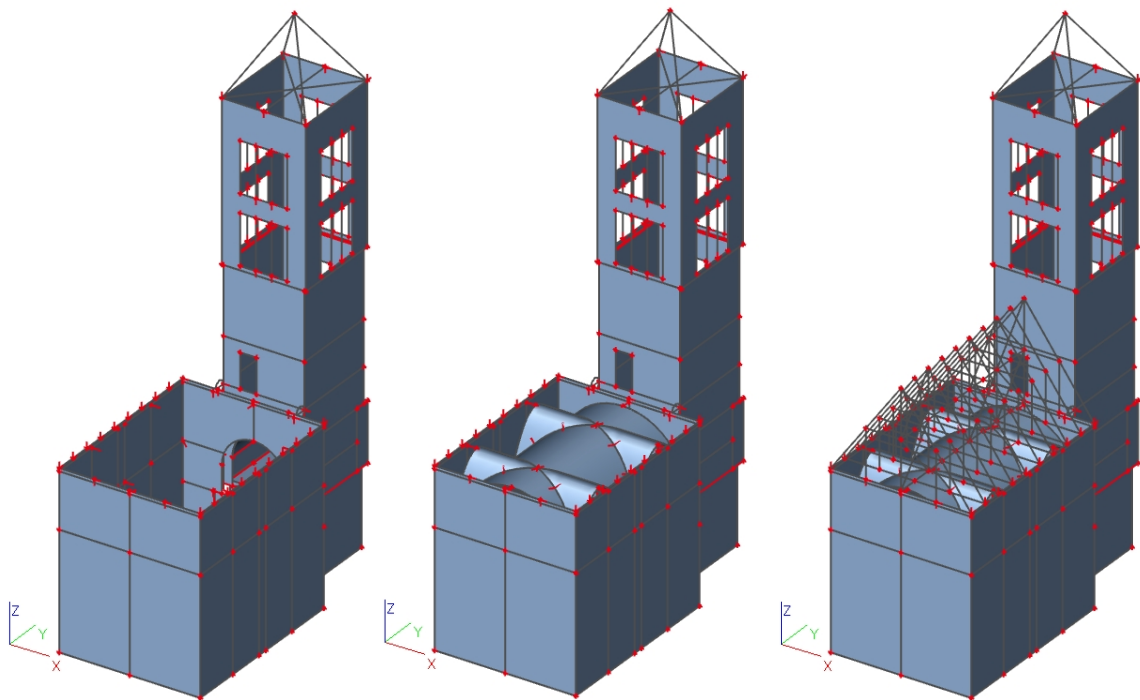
Nave. Left, nave walls. Center, nave vault. Right, Nave timber trusses.
